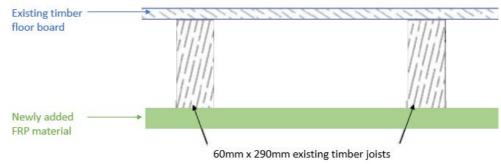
Option 1 Covering up the entire soffit of timber floor system
